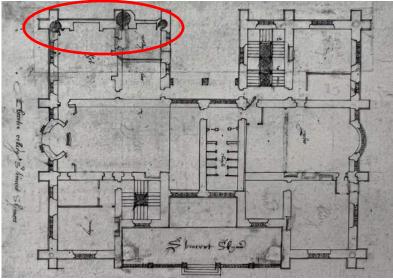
John Thorpe, plan of house called Thornton College, Lincolnshire, showing placing of ovens within corner buttresses (Summerson).
